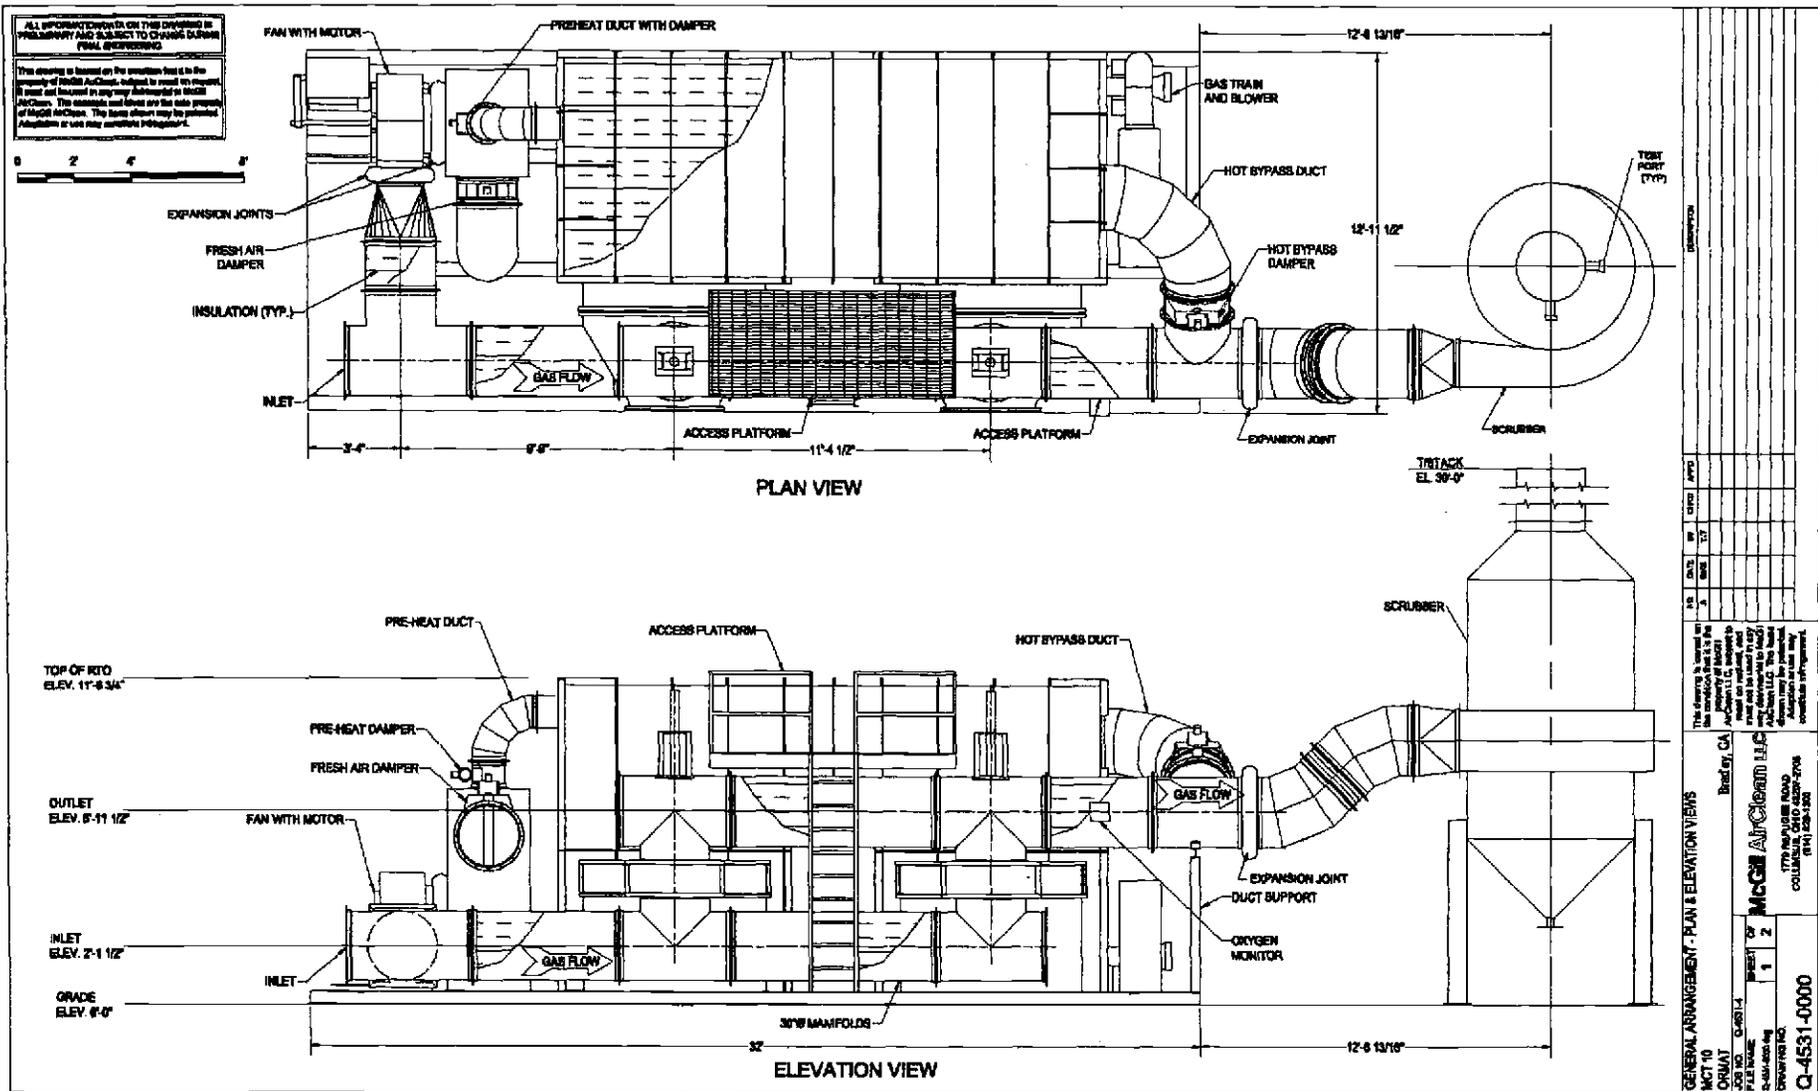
East Brawley RTO Unit/Caustic Scrubber System General Arrangement – Plan and Elevation Views
